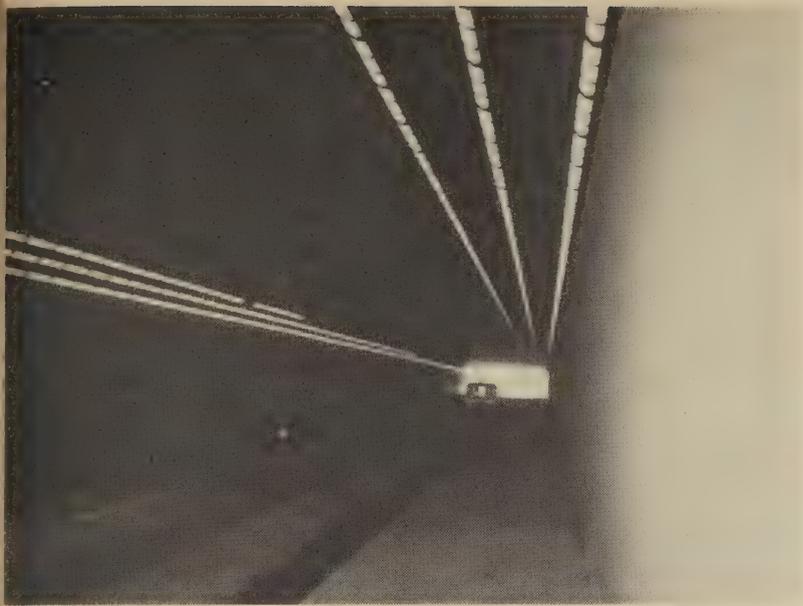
Southwest International Airport Tunnel, Fort Worth, Tex.—daytime, all lights on.
